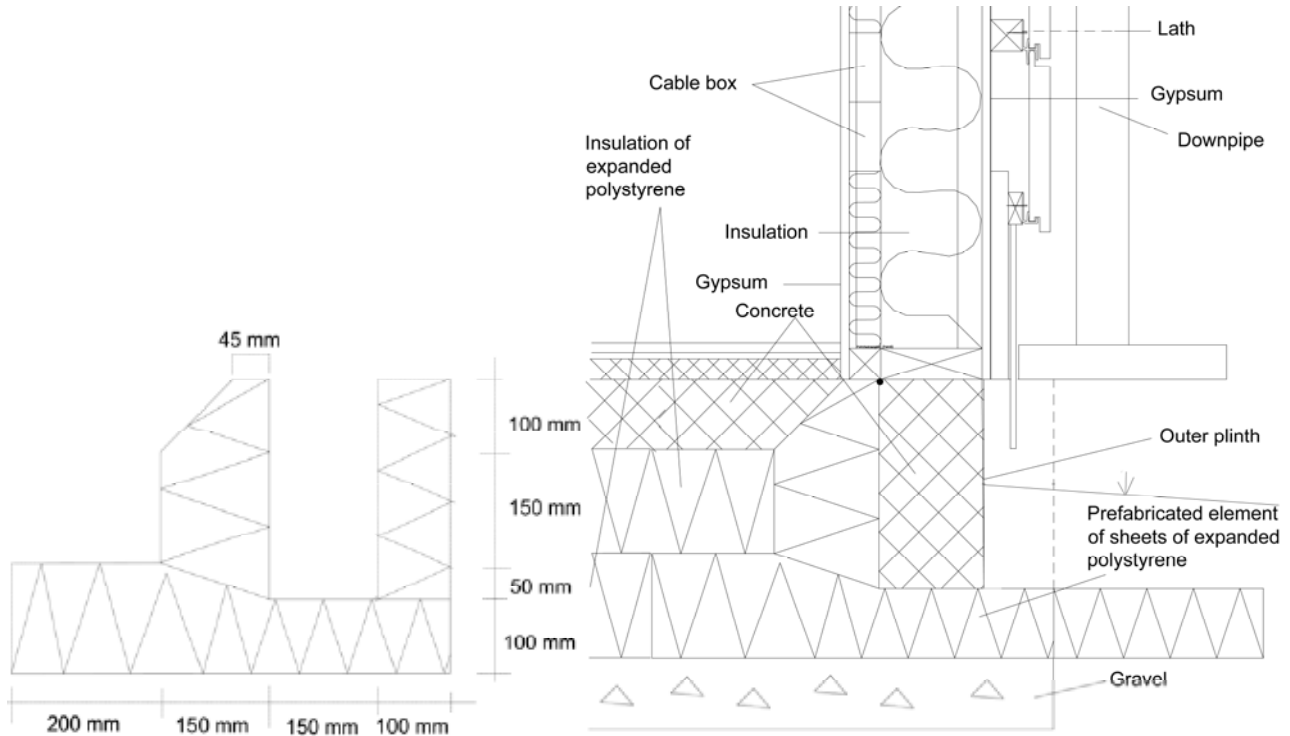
a): left, the prefabricated element made of EPS, b): right, the EPS element used as the strip foundation of a traditional wood-stud wall within mineral-based insulation.
